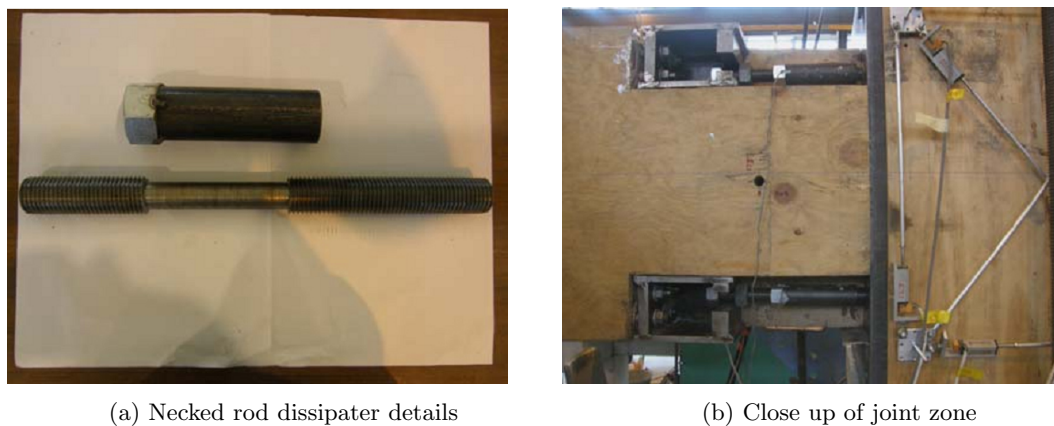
Exterior beam column joint specimen (Iqbal *et al.*, 2010)
